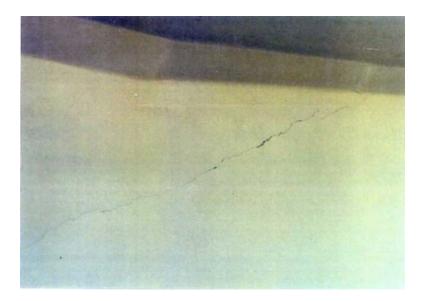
Type DBT Girder – Typical crack in girder end block at transition zone
